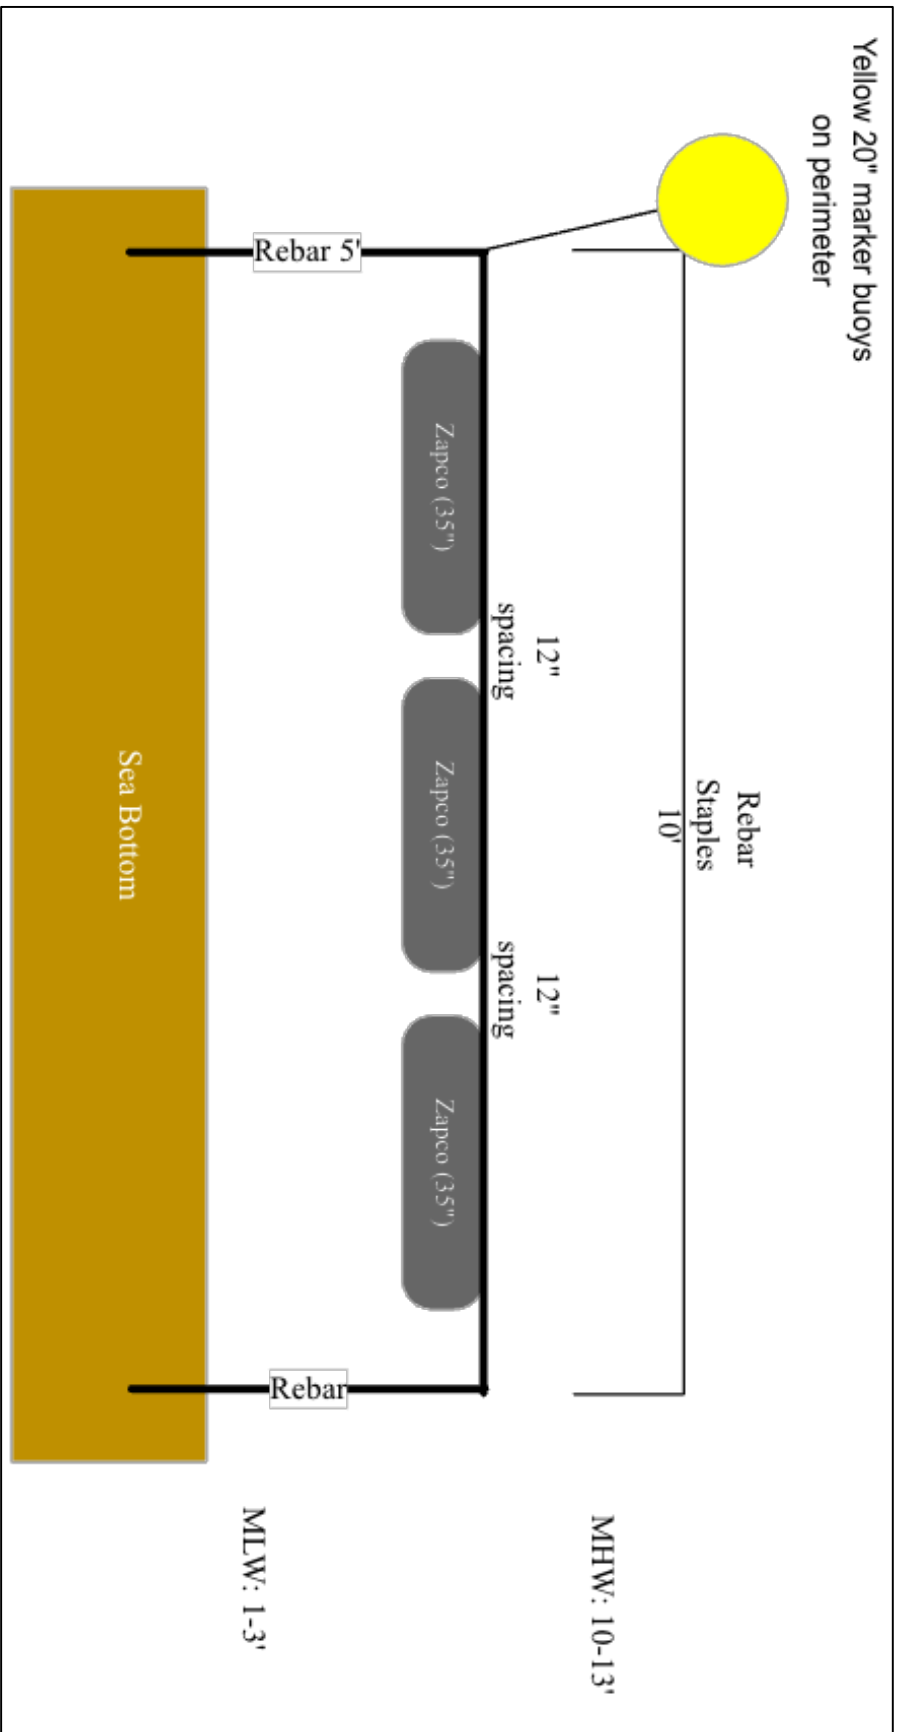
Cross-section example of Zapco's (located on the western side of arrays 3-4 in Layout Scenario B).
